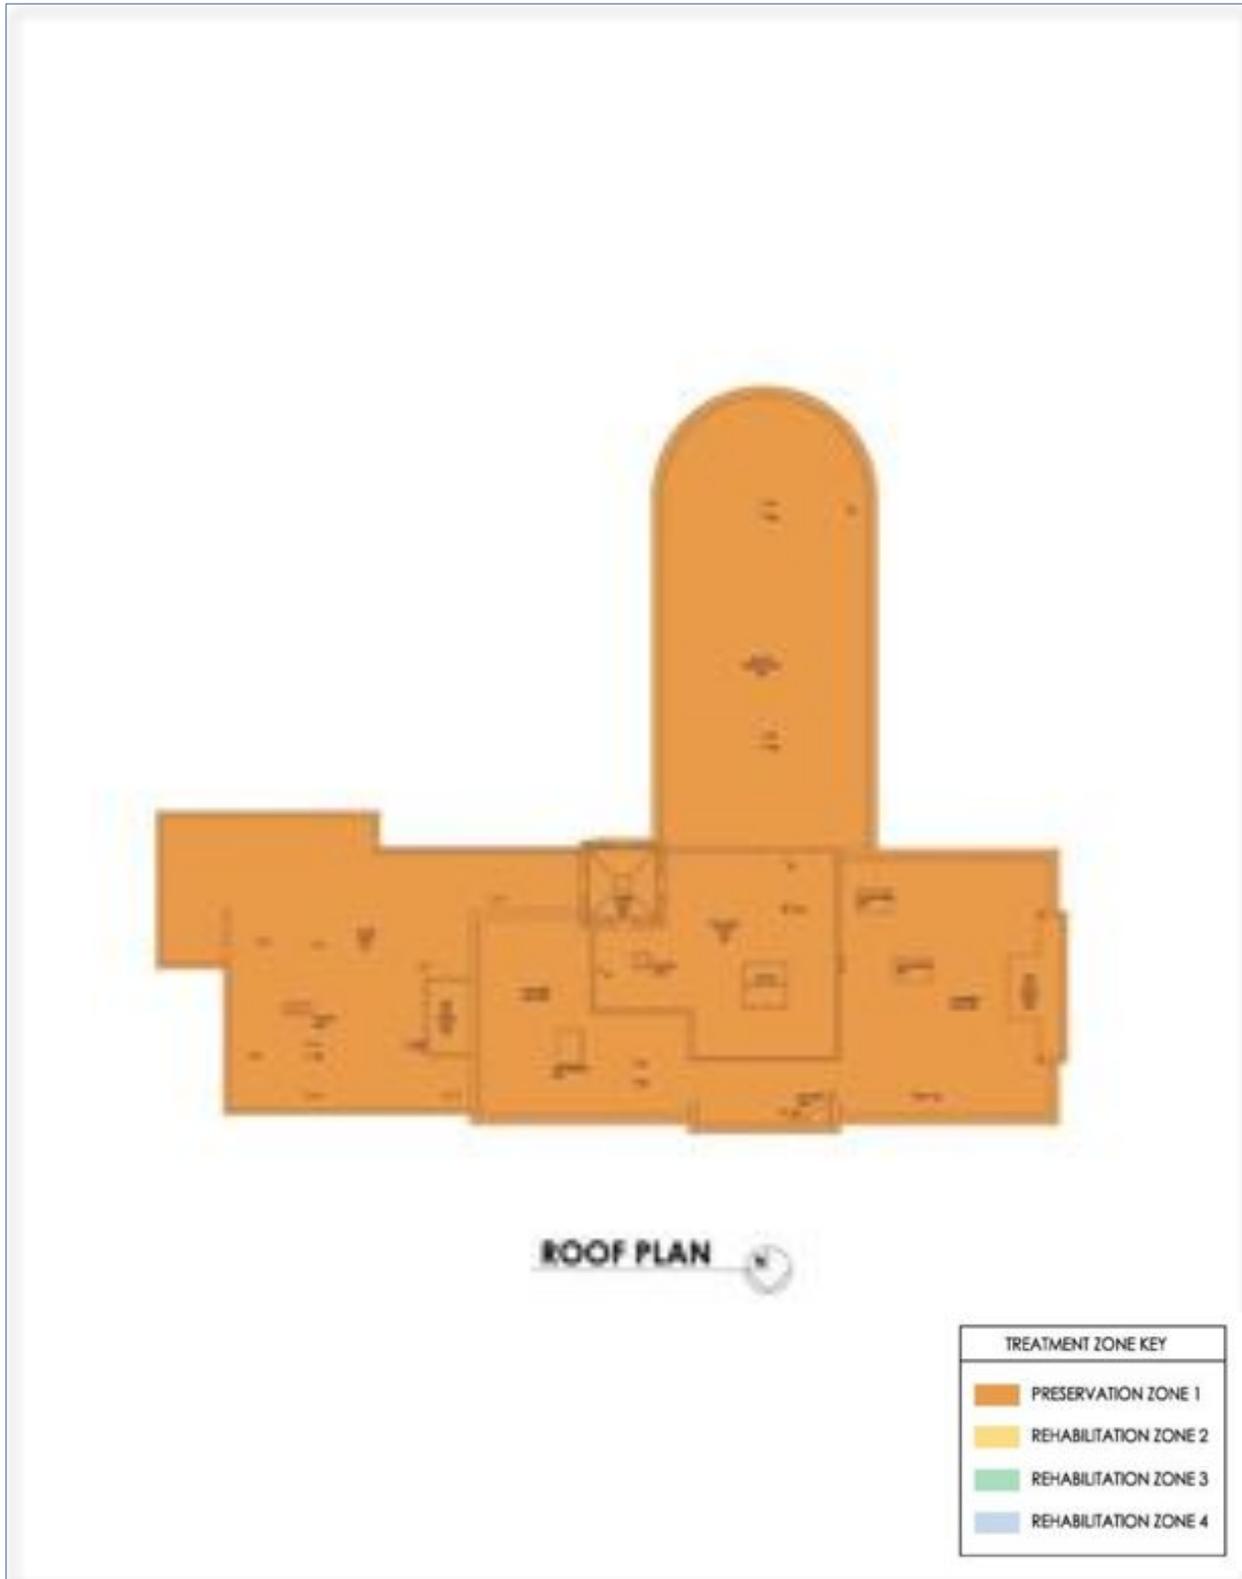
Preservation Treatment Zone Diagram – Roof Plan (SRJA 2013)
